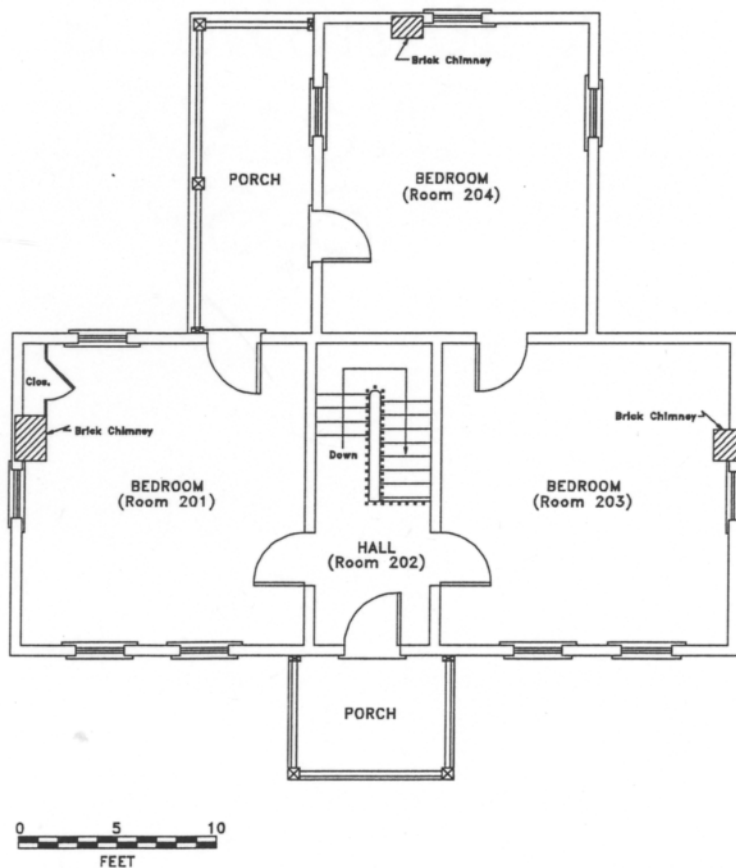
Second floor plan of the Williamson House, as originally constructed, ca. 1880.
